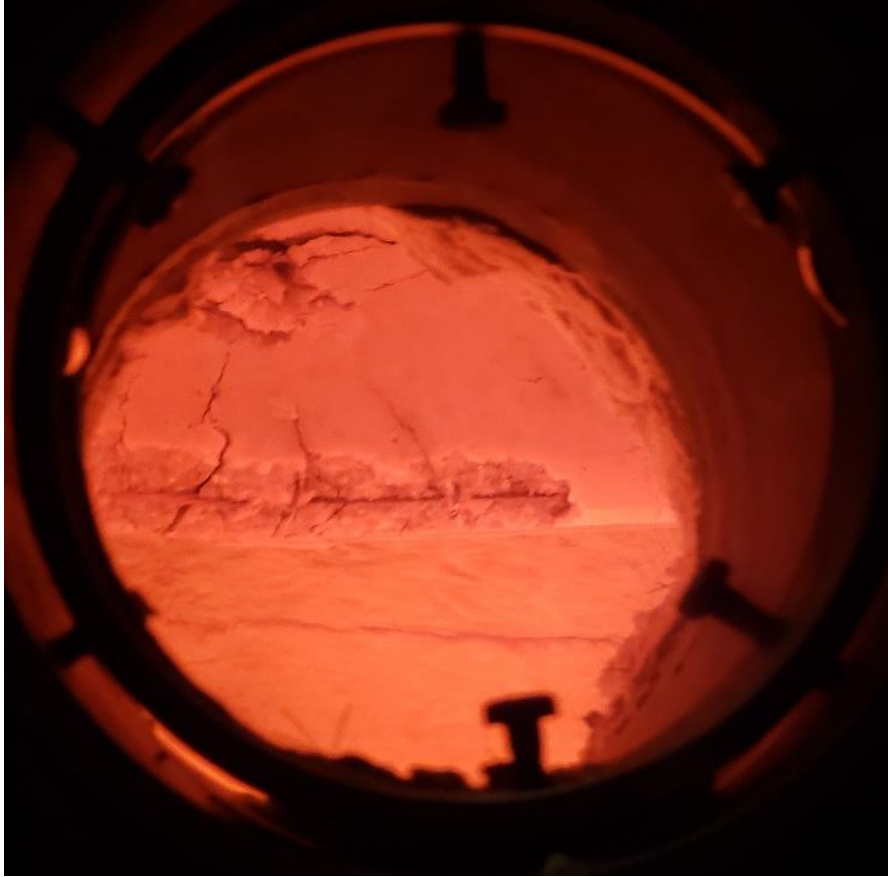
Cracking and crushing of concrete in beam N1 during failure
